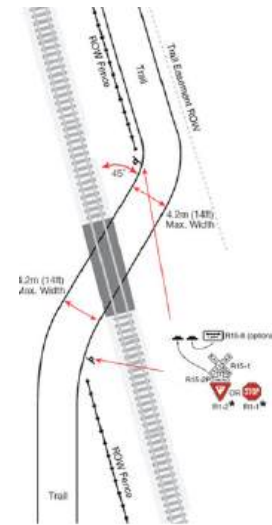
A 45-degree rail-trail crossing, Rails with Trails
